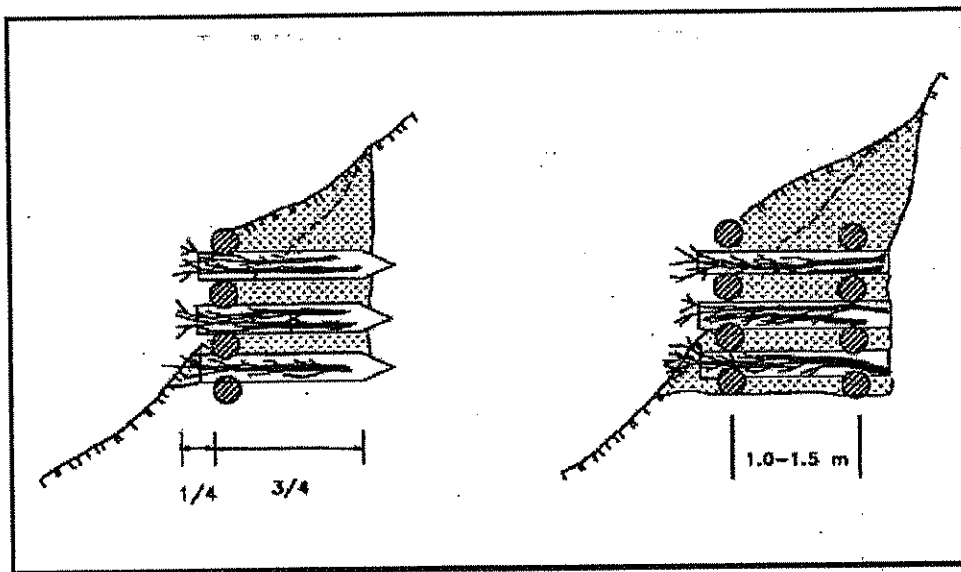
Live Vegetated Crib Wall (Schiechl and Stern, 1996)
